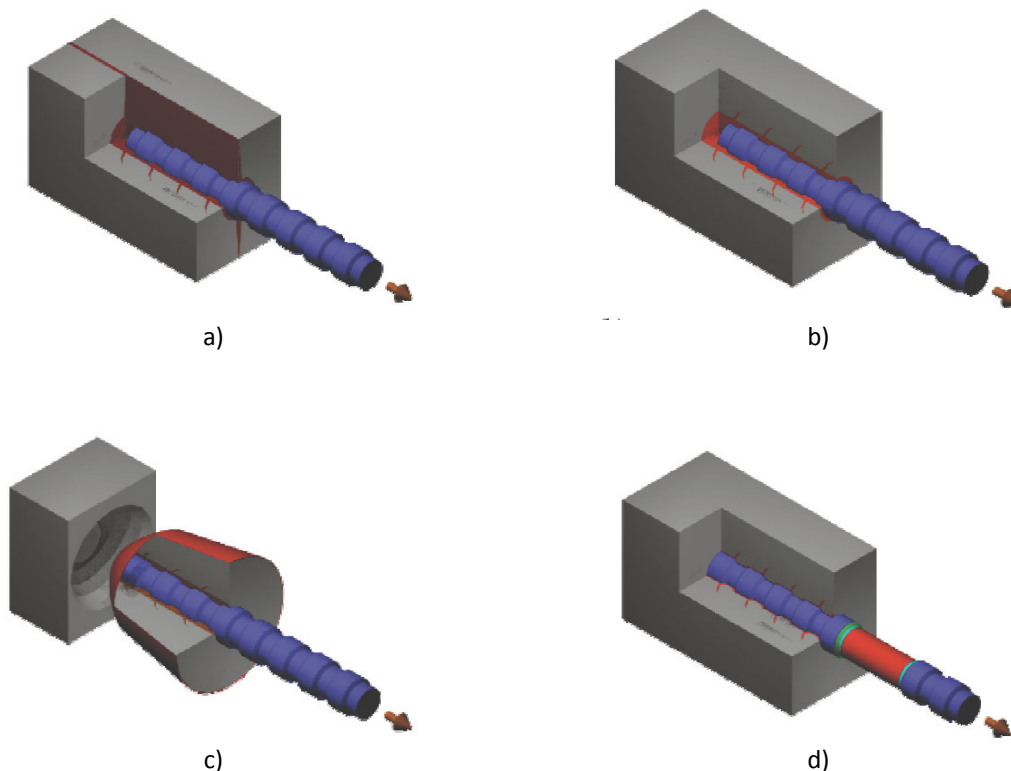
Typical failure modes in pull-out tests, adapted from Dominguez [172]:
